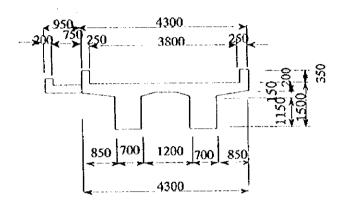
Typical Cross Section at the Mid Span of 334 pk 3 Bridge Dimensions at mid span of other bridges with such span length of L=11.5 m, L=9.5 m and L=7.3 m are given in Appendix 16-1.
